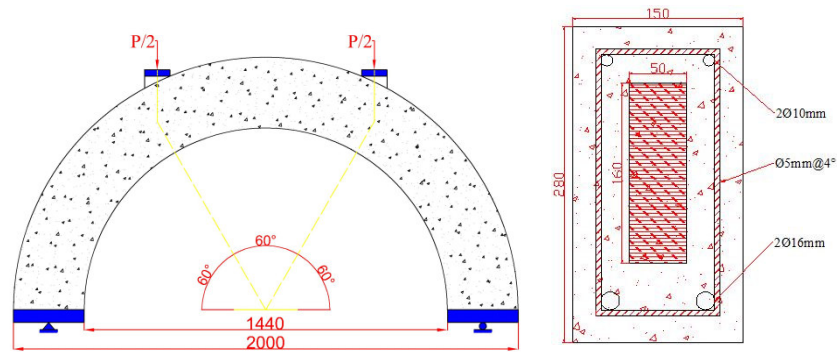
The Geometrical Details and the Steel Reinforcement of Specimens
